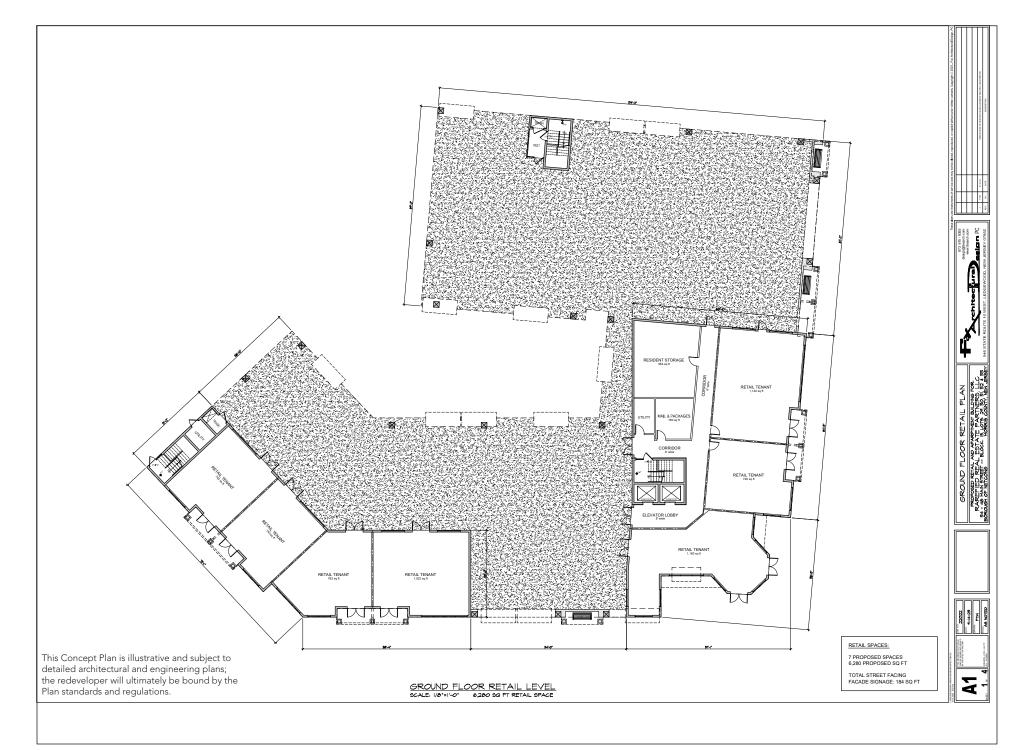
CONCEPTUAL GROUND FLOOR RETAIL LEVEL AND SITE LAYOUT
